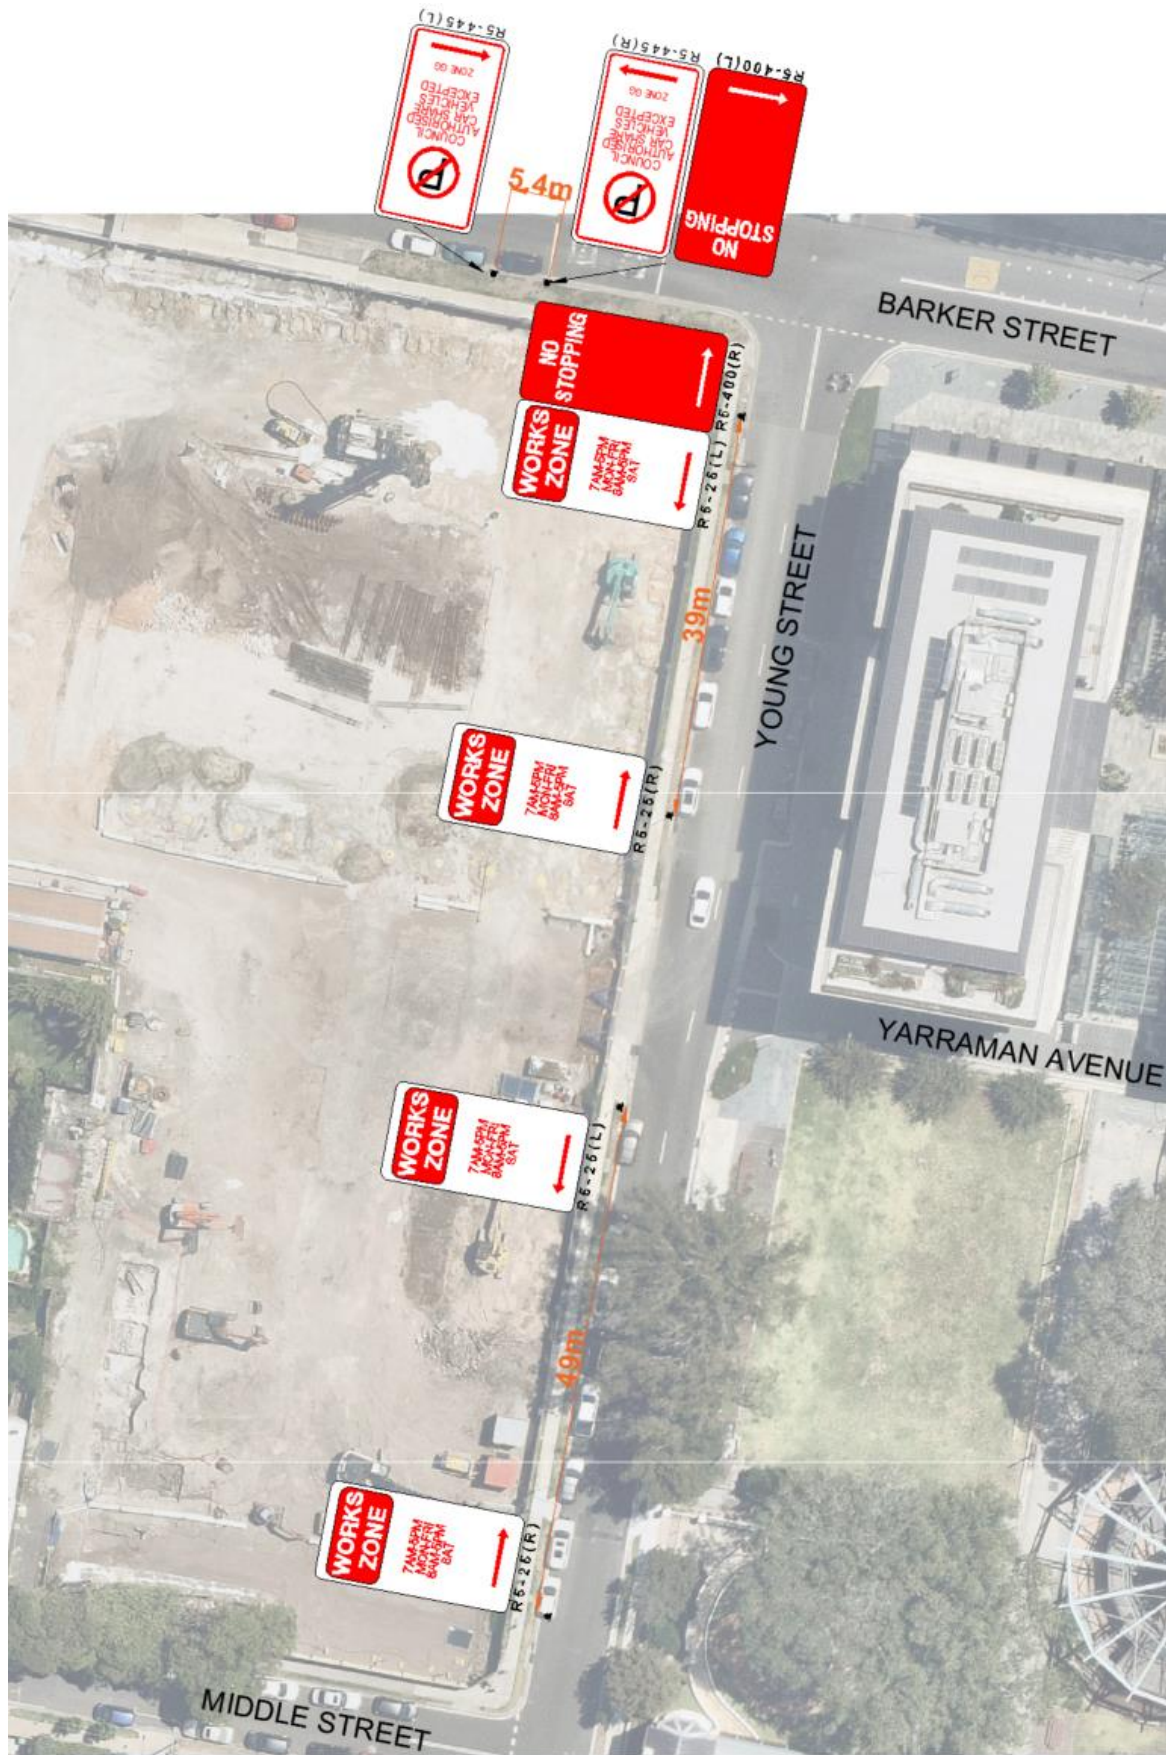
Proposed Changes to Signage on Barker Street and Young Street – Stage 2
